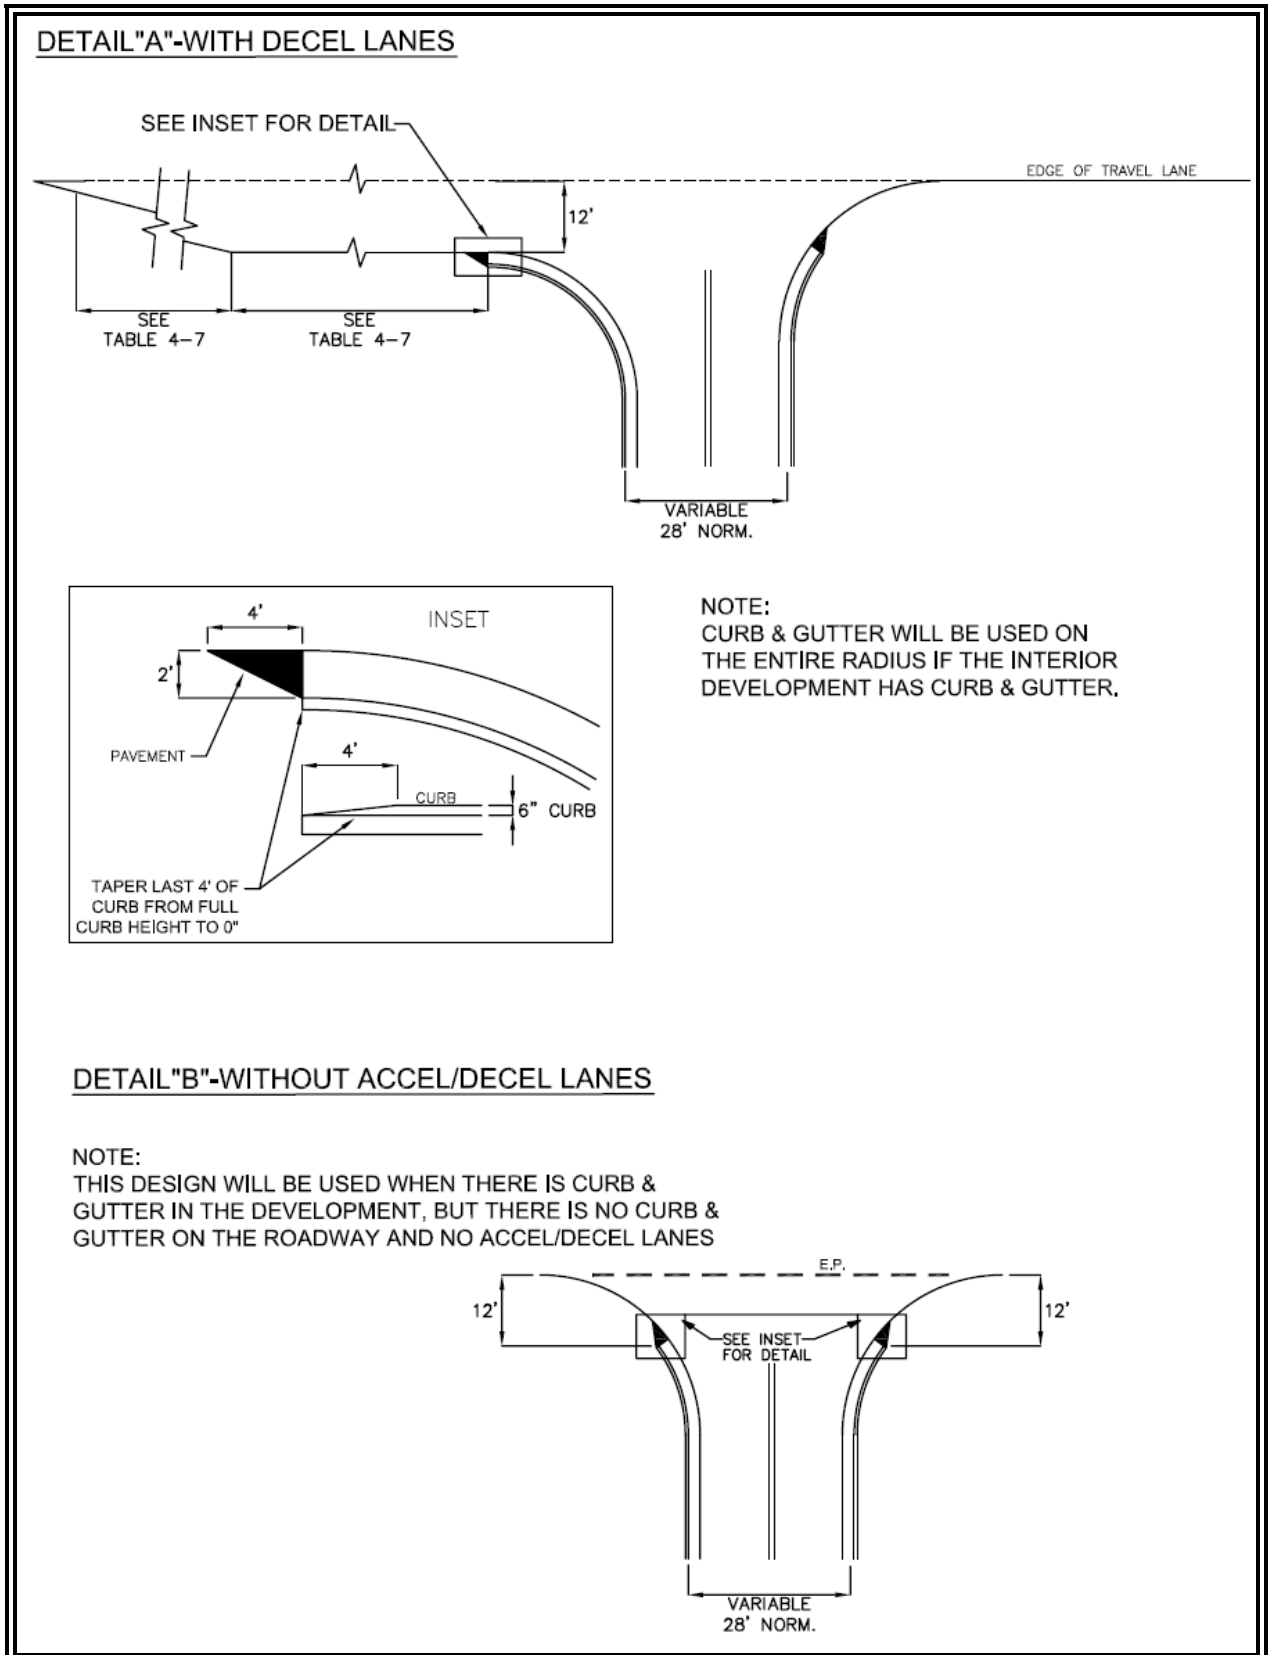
CONNECTING DRIVEWAYS WITH CURB & GUTTER TO RURAL SECTIONS
